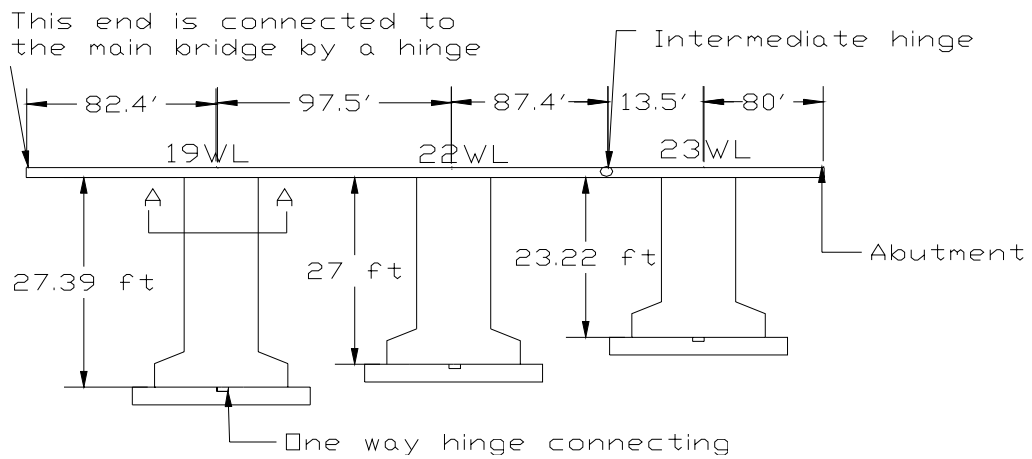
The Elevation view of 1RWL-2RWL Off-Ramp (not to scale)
